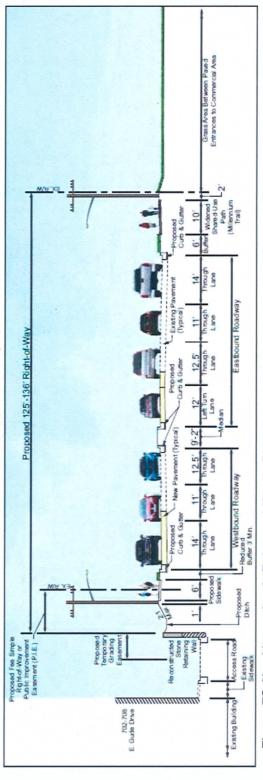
Alternative 3: Enhanced Master Plan, Recommended Alternative. Proposed typical roadway along East Gude Drive at Section B-B, approximately 2000' east of Calhoun Drive.
